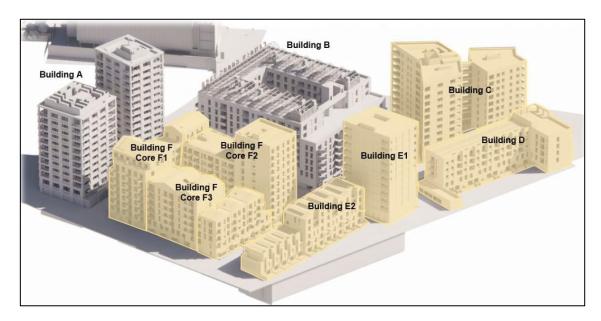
Buildings Subject of the February 2025 Amended Proposed Development Highlighted Yellow
